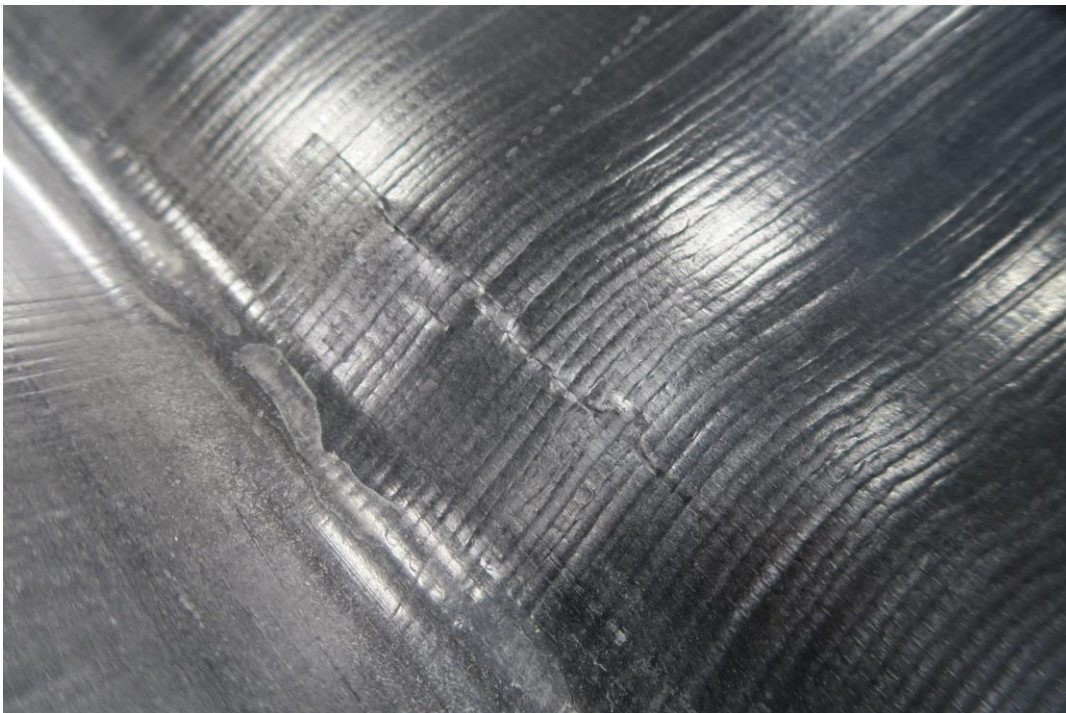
First Failure anchor type 2 - soft wood filler plate
